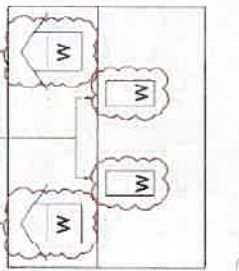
UNIT BLOCK A - SOUTH ELEVATION MODIFIED EXTERIOR FINISHED AS SHOWN
